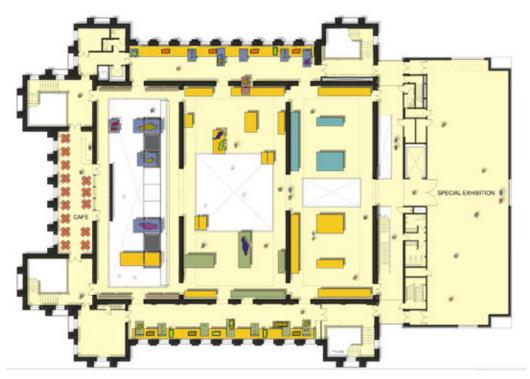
First floor plan of Great North Museum. Farrells ©
